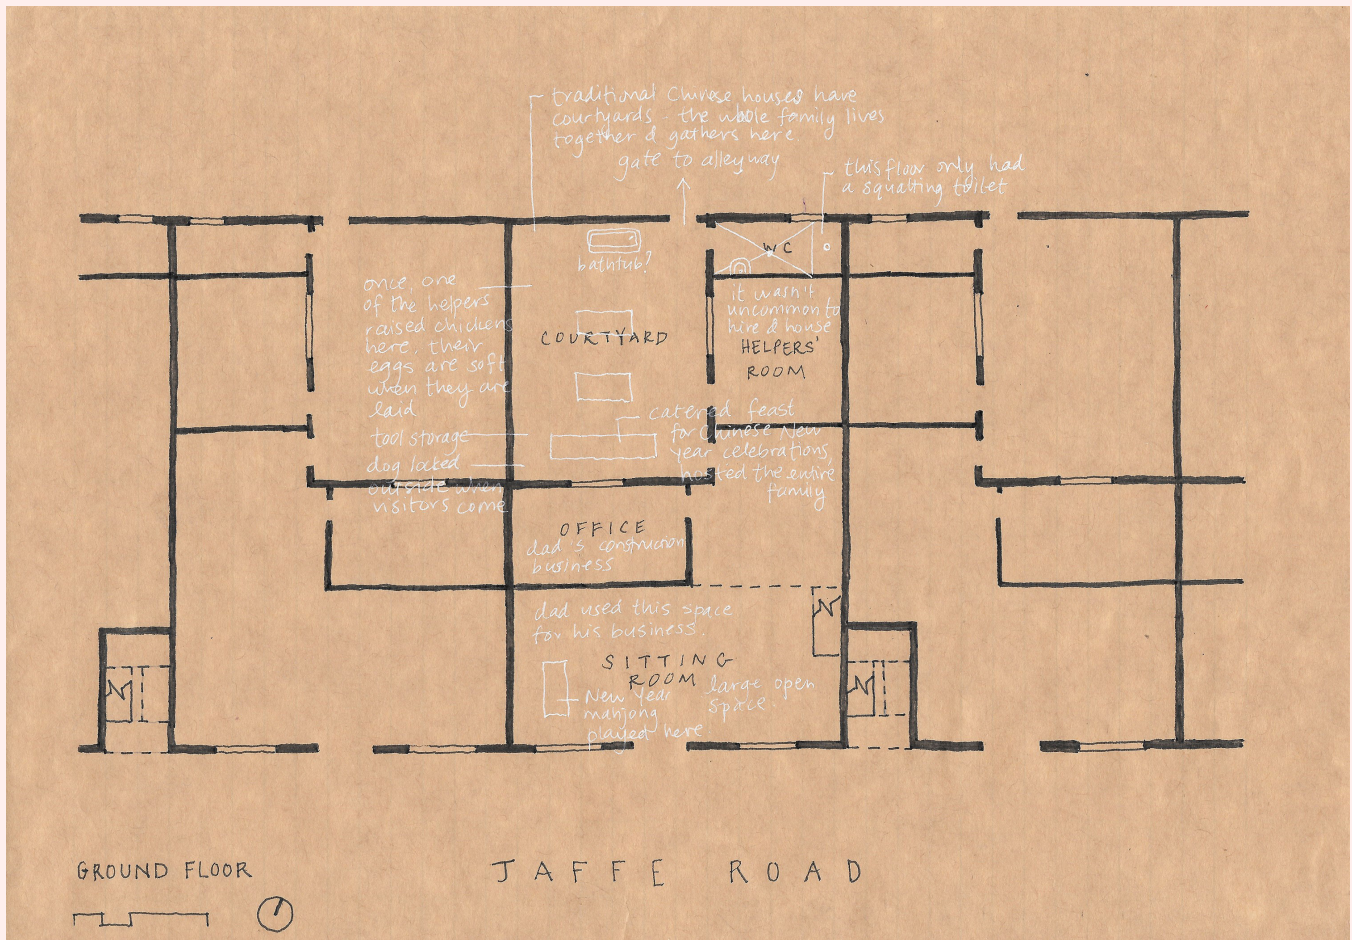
Home in Wan Chai ground floor plan, image by author.
